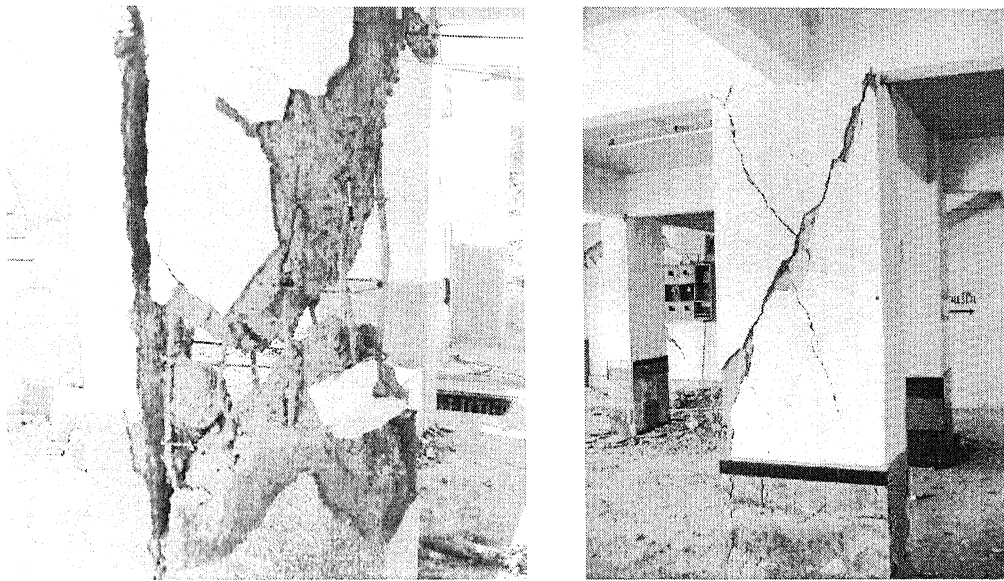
Shear cracking of non-ductile columns of an open ground story building in Bhuj (Murty et al., 2002)
